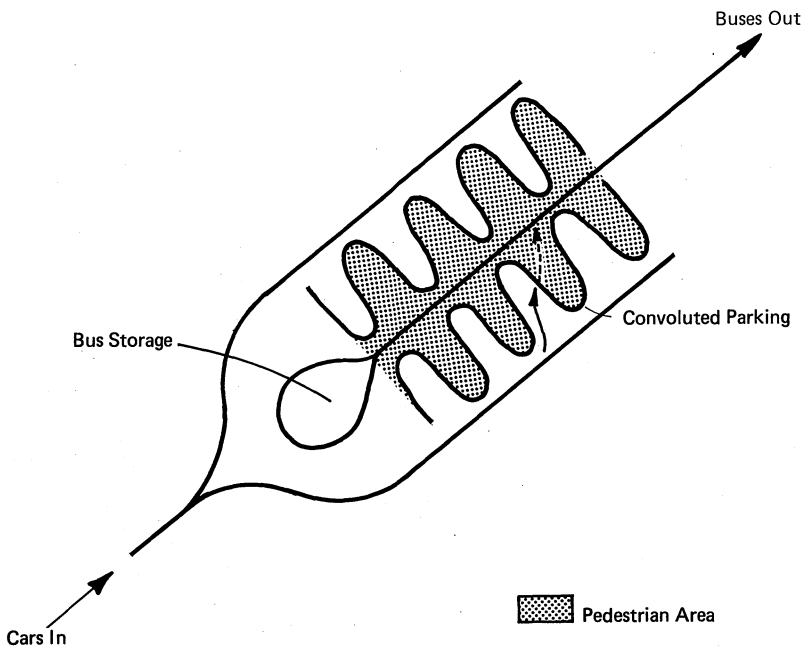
B-2. Parking Lot, Showing General Arrangement to Separate Auto, Foot, and Bus Traffic
